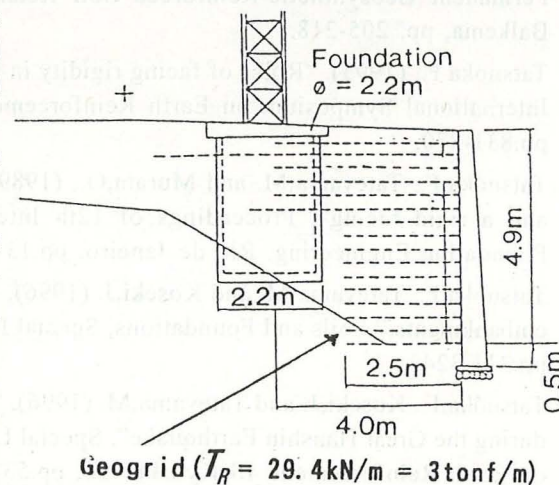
Typical cross-section of GRS-RWs for the Kobe Line at Amagasaki (Location No. 7 in Fig. 2).
